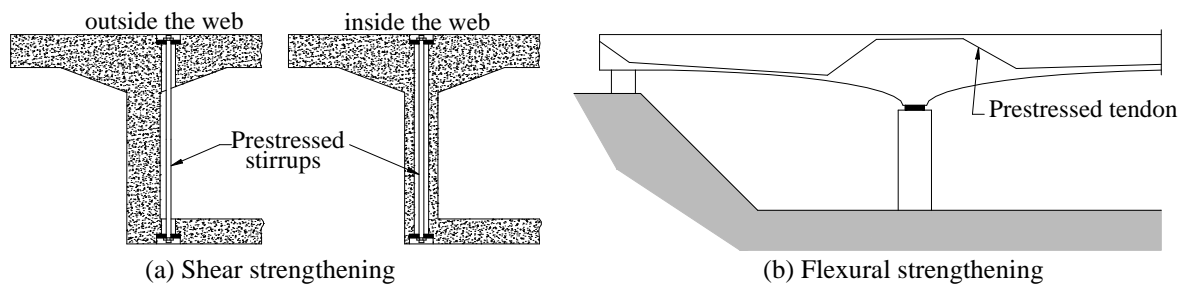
Repair of RC beams by post-tensioning additions.
